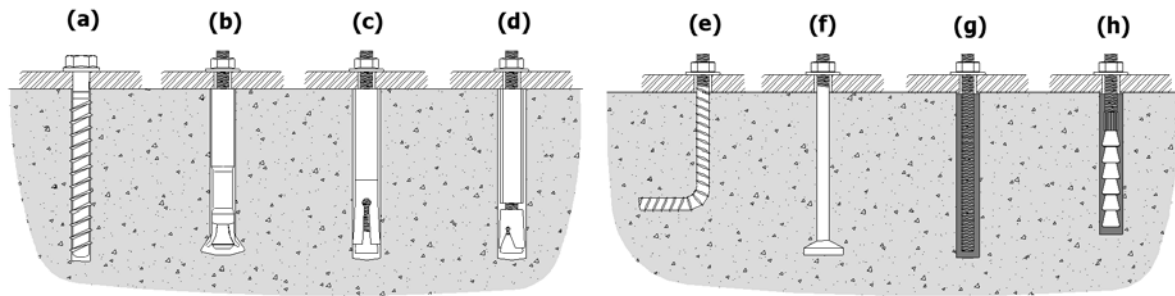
Different anchor types, depending on the installation procedure: (a) concrete screw, (b) undercut anchor, (c) expansion anchor - sleeve type, (d) expansion anchor – bolt type, (e) cast-in-place ribbed and deformed bar, (f) cast-in-place headed stud, (g) bonded anchor with threaded rod, (h) special bonded anchor.
